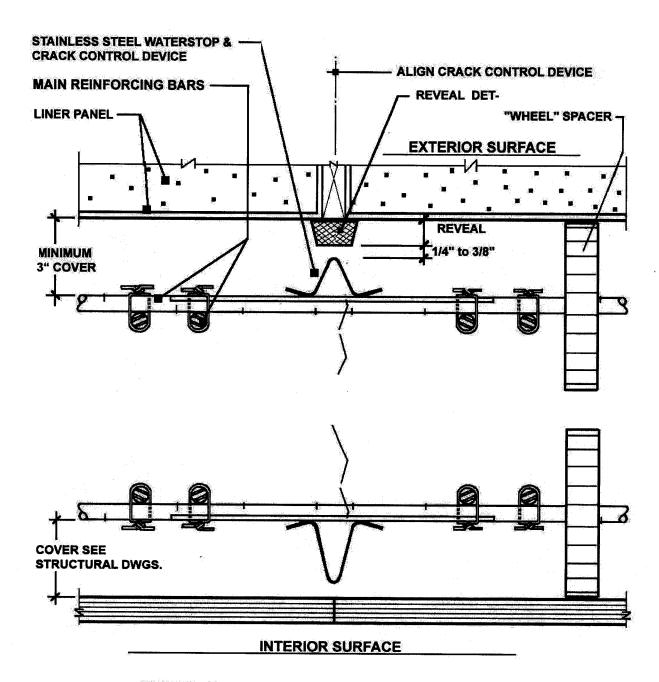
WALL REVEALED CONSTRUCTION JOINT
